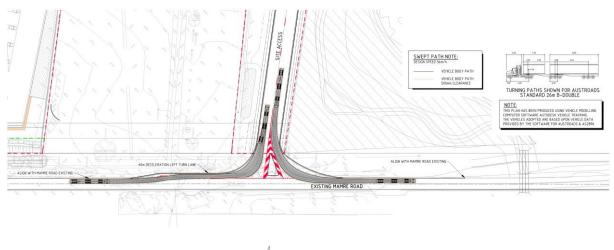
Functional Layout (existing Mamre Road conditions)
